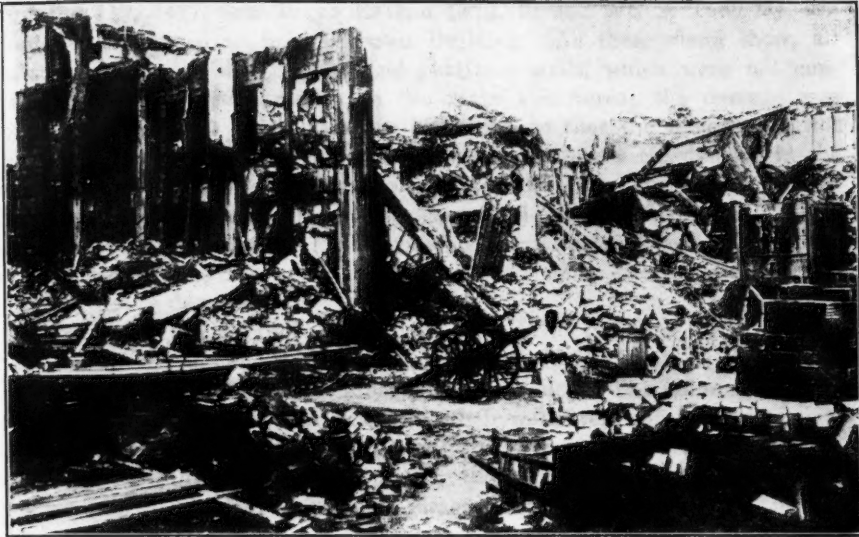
RUINS OF THE NAIGAI BUILDING
